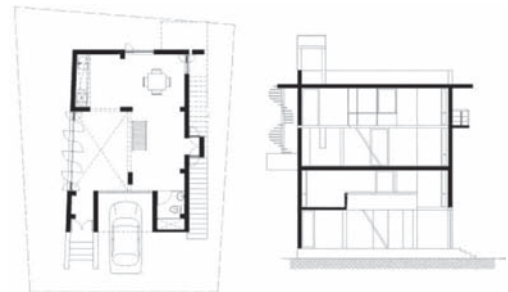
Plan and section of Building 6. All walls of this building are of rammed earth.
